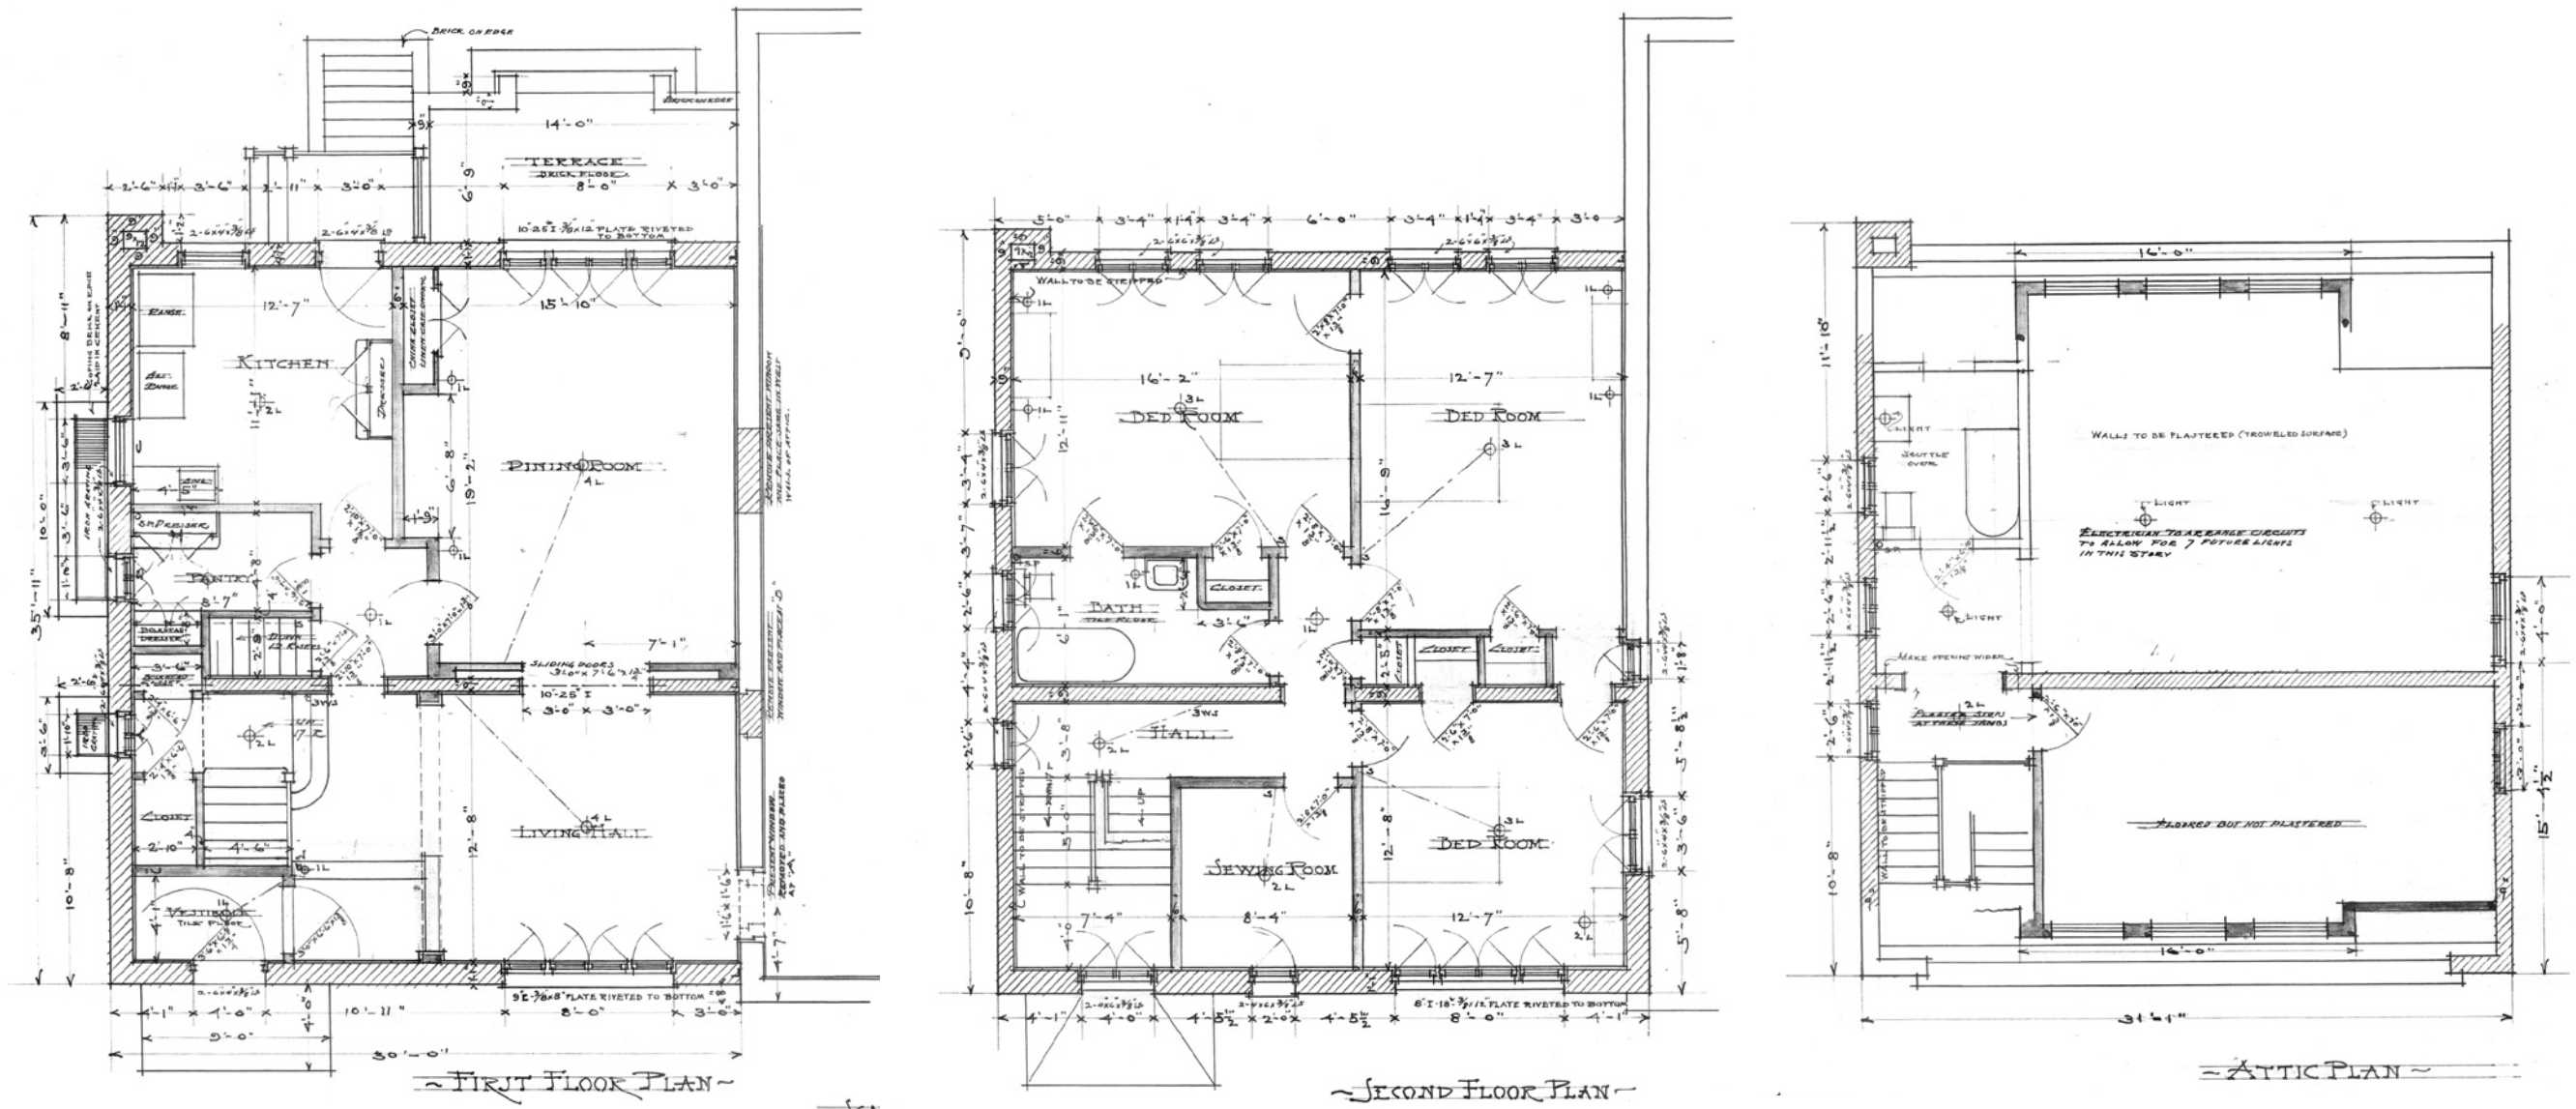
Original 1912 floor plan drawings by W. Gordan Beecher, Architect
